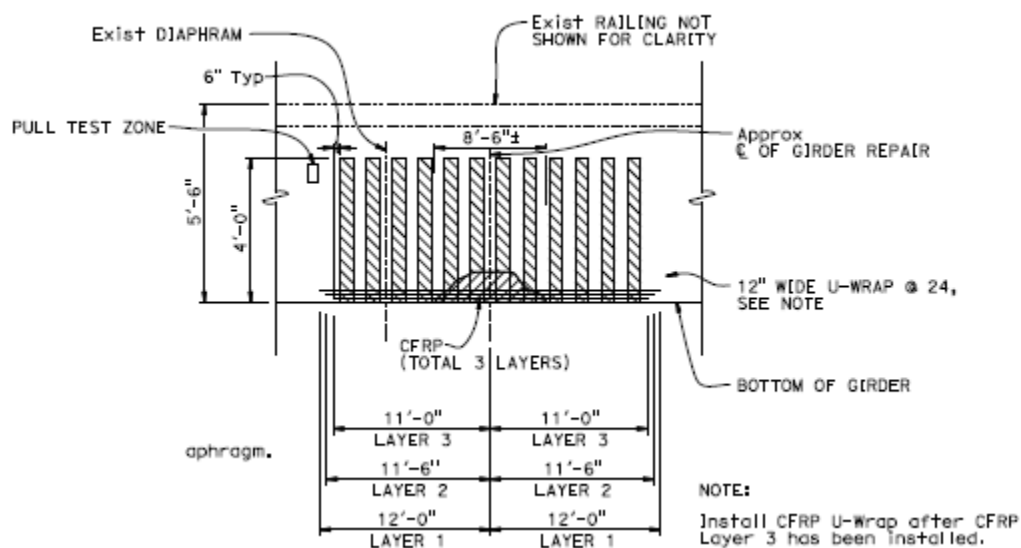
Typical FRP Detailing for Installing CFRP U-Wrap
